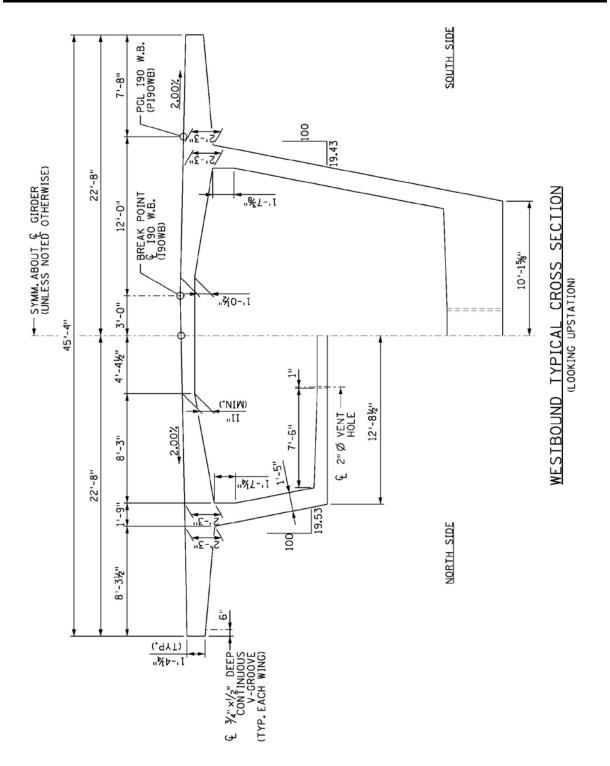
Westbound Typical Box Girder Cross-Section
